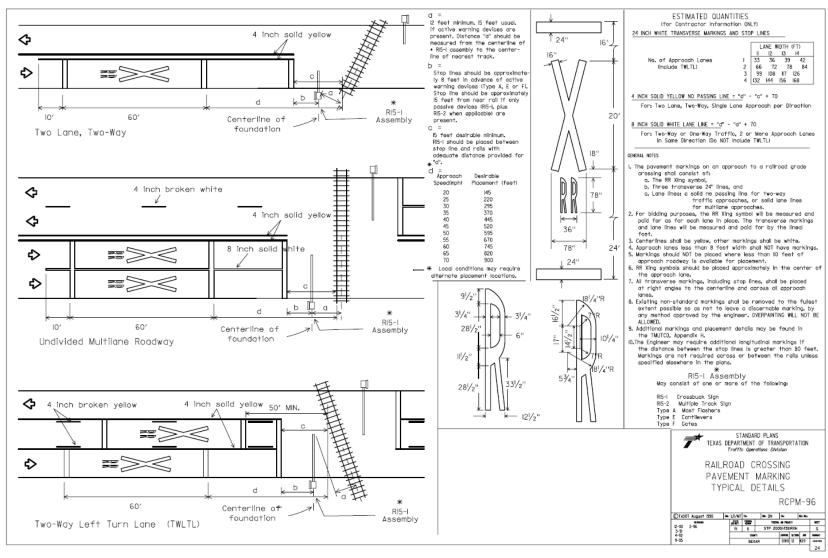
Alternate pavement markings at highway-rail grade crossings.
